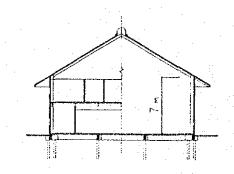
Section of the Sanitary Engineering Laboratory
